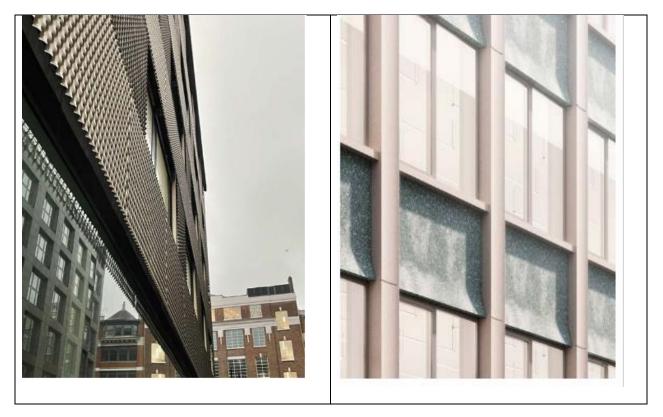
Existing Great Sutton Street mesh removed to expose existing terrazzo
